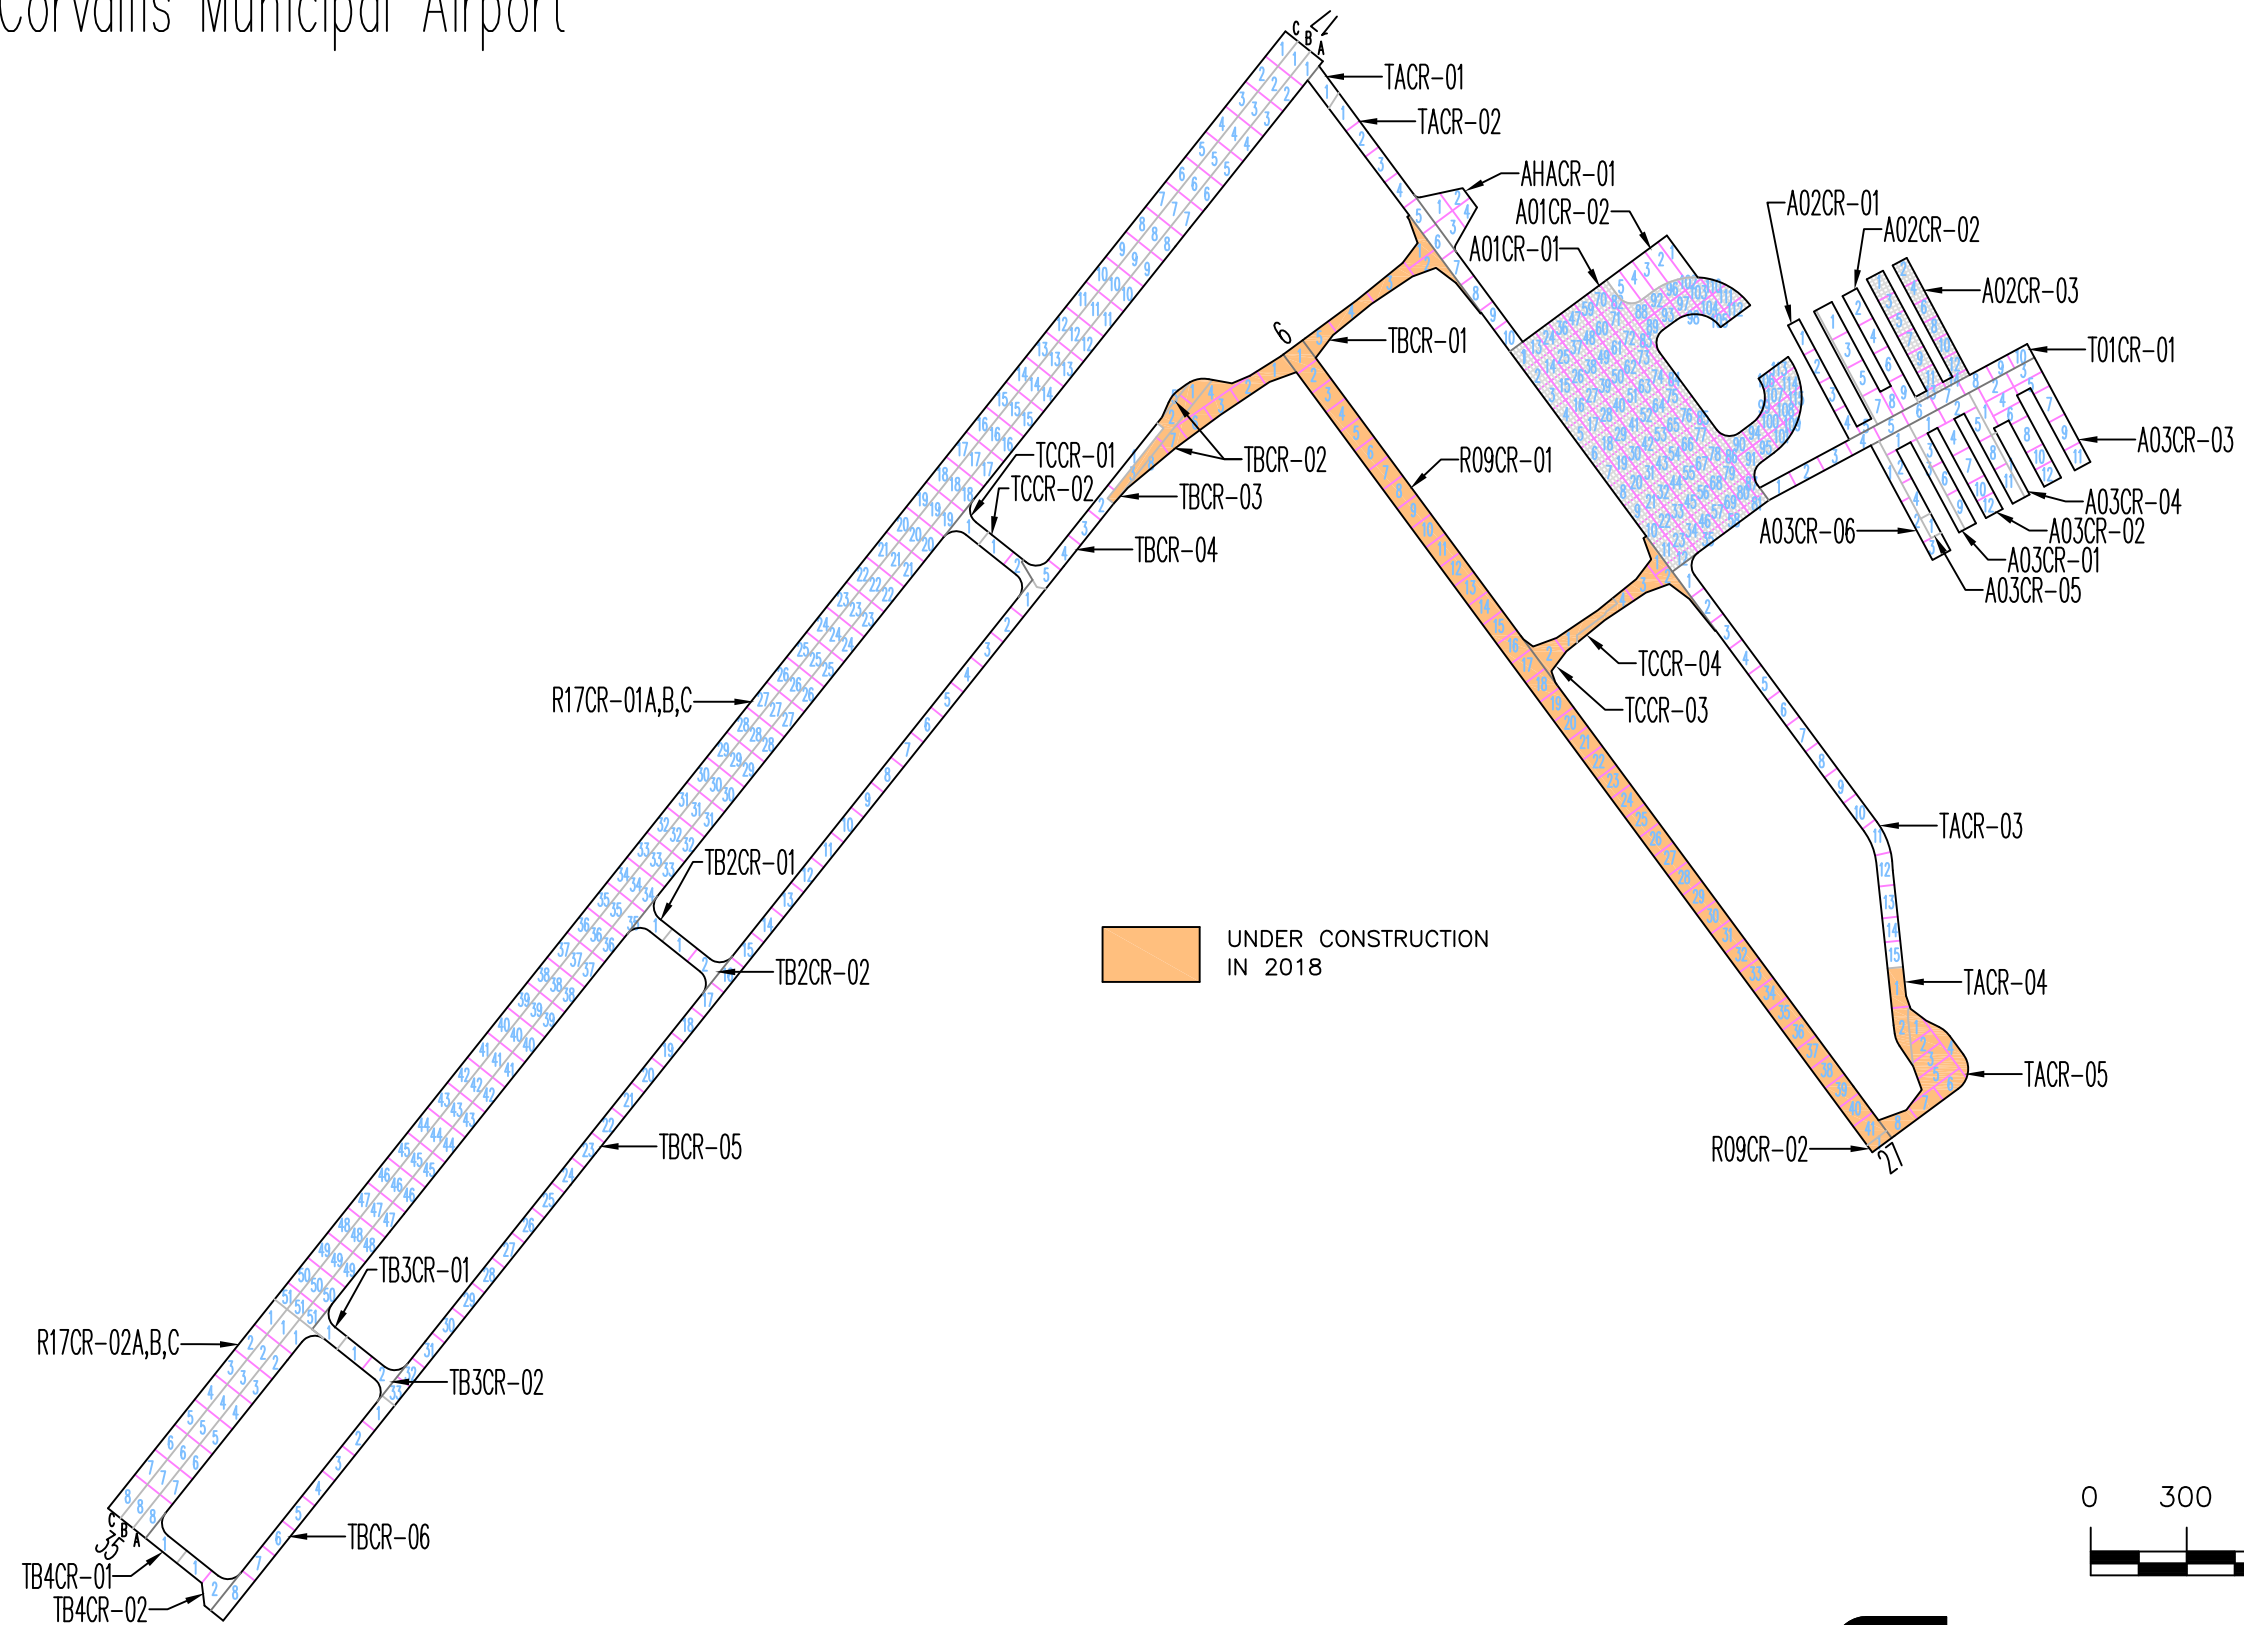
B. Airport Layout, Dimensions and Pavement Cross-Sections.
